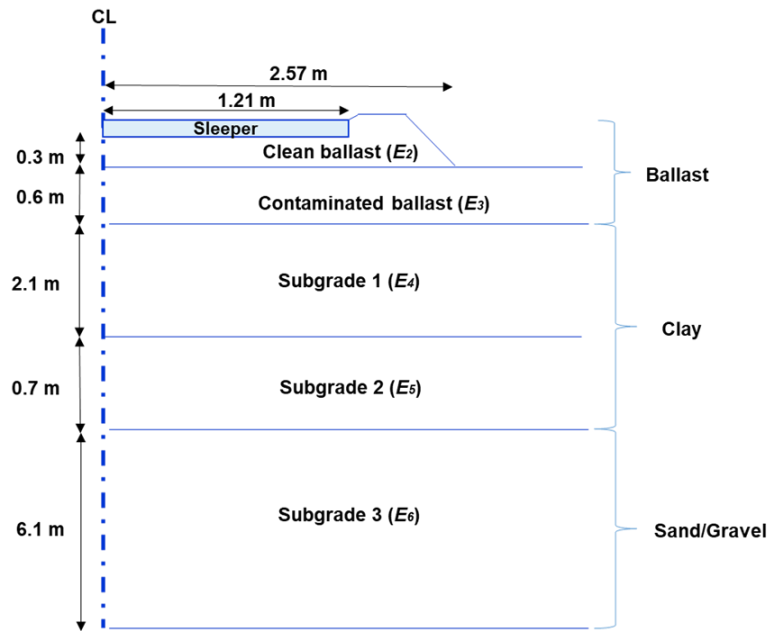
A cross-section of the railway track section near Leominster station, UK
